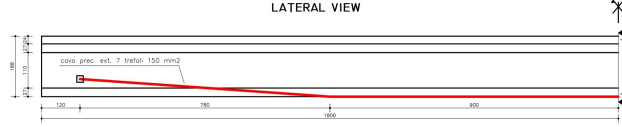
External prestressed cables layout profile (red solid line) adopted as a traditional intervention proposal .
